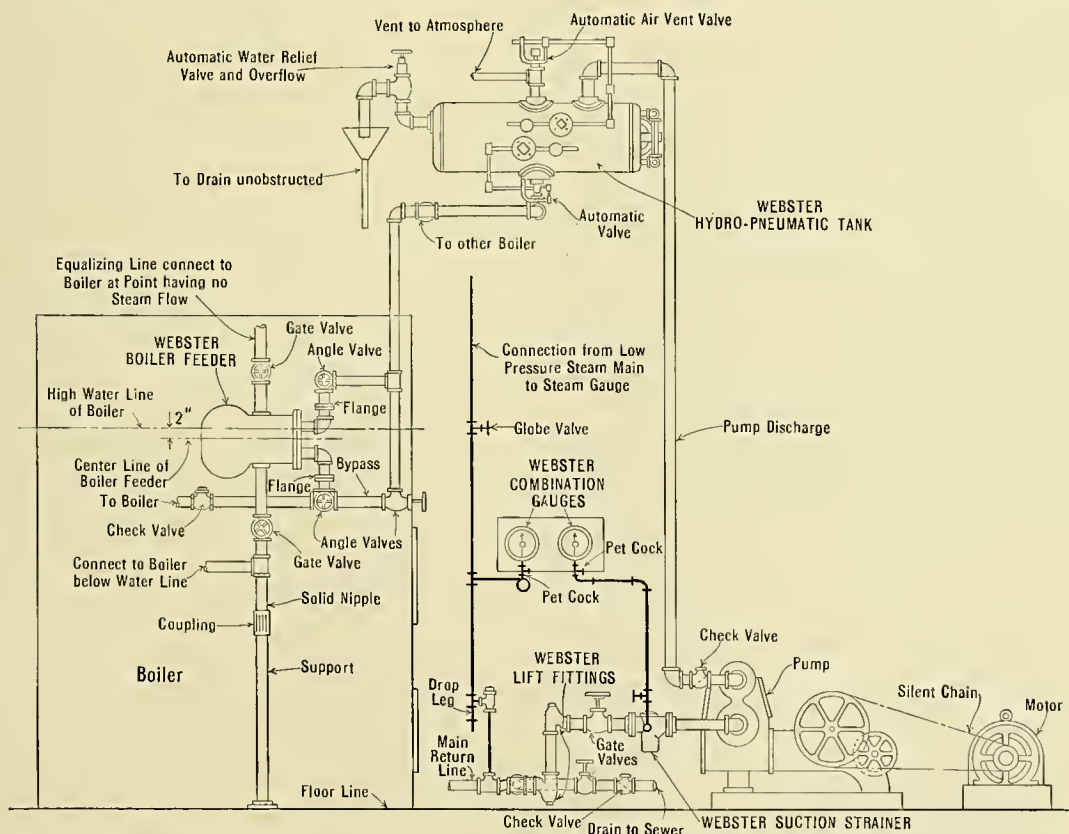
Typical connections to vacuum pump, double-control hydro-pneumatic tank and boiler feeder
